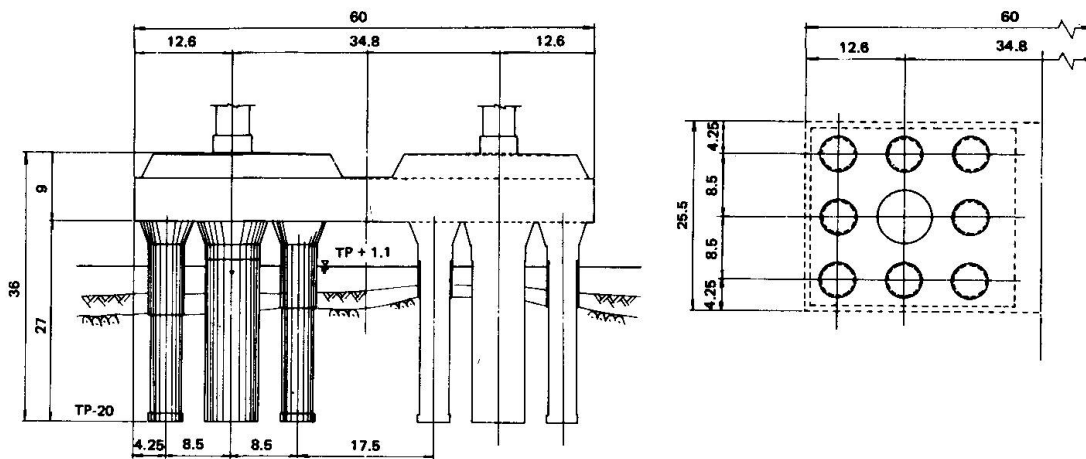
Multi-column foundation of Ohnaruto Bridge
